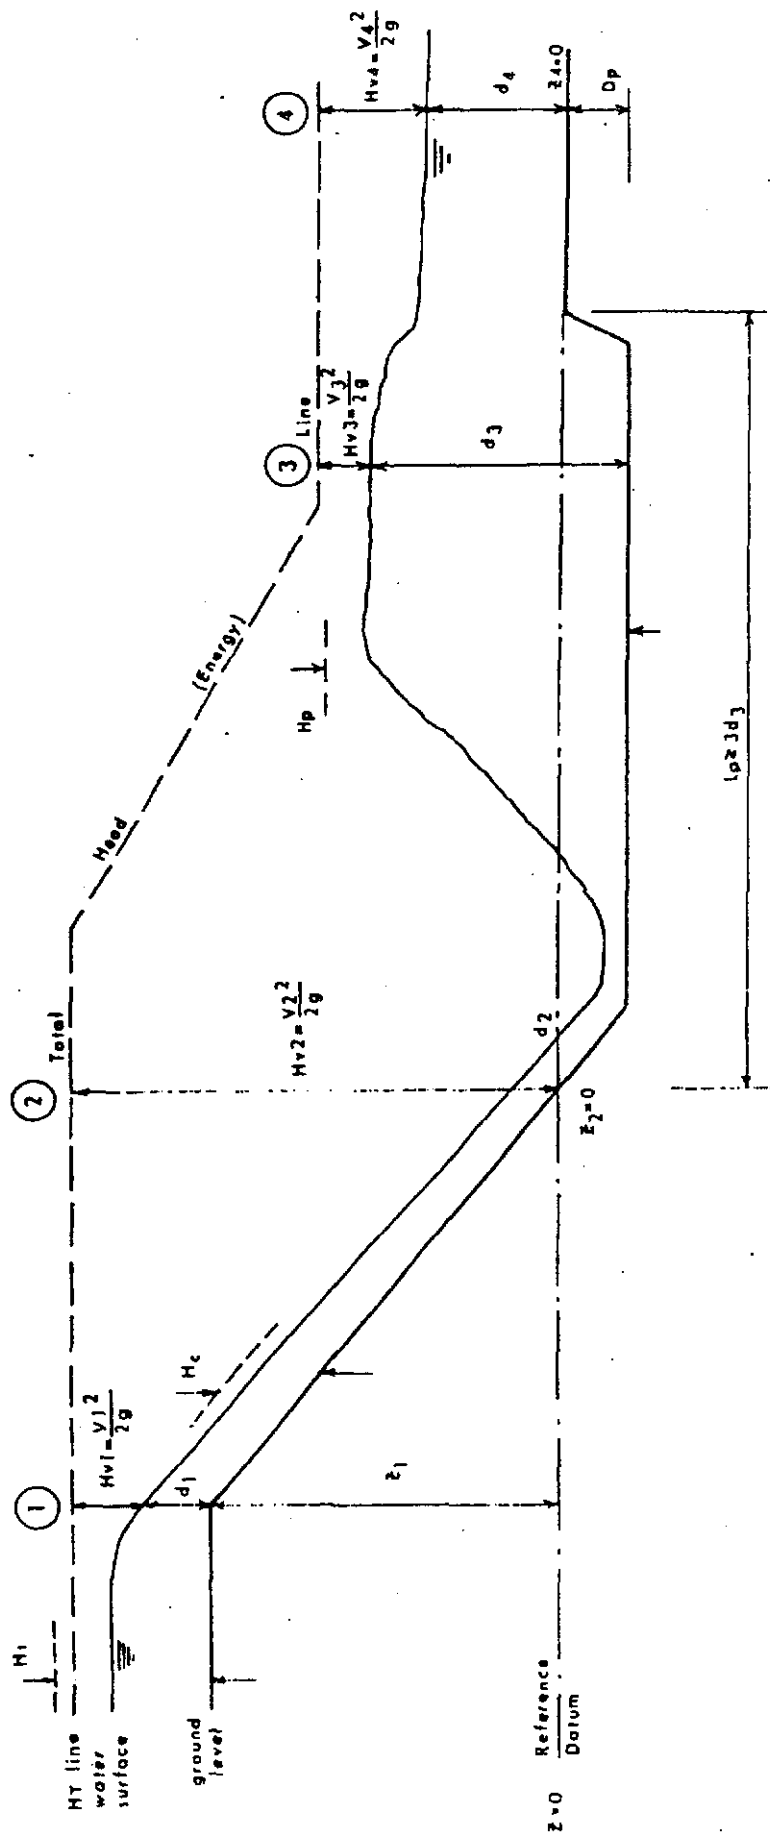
Longitudinal section of flow through a typical chute spillway.
